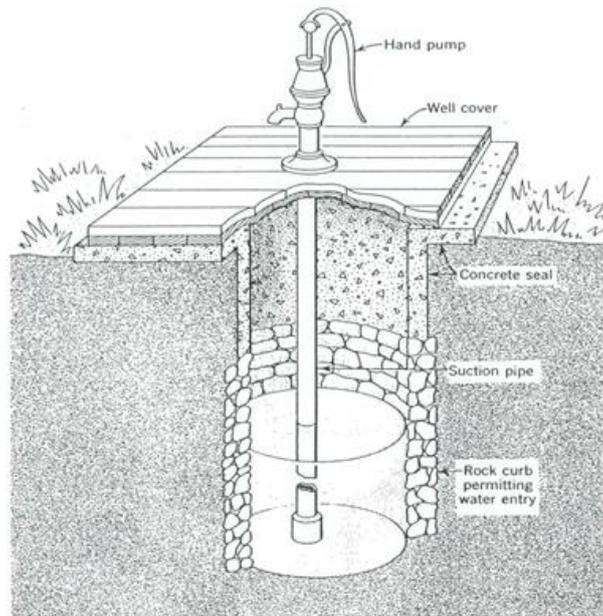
Typical domestic dug well with a rock curb, concrete seal and hand pump. (Source: Todd, 1980)
